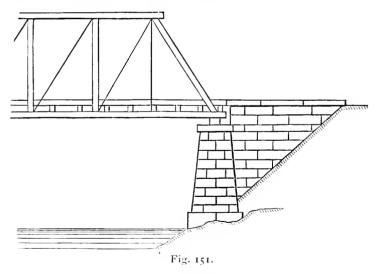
shows the general arrangement of the T abutment for an overgrade bridge. For an undergrade truss the bridge seat would be lowered by an amount equal to the depth of the truss.
